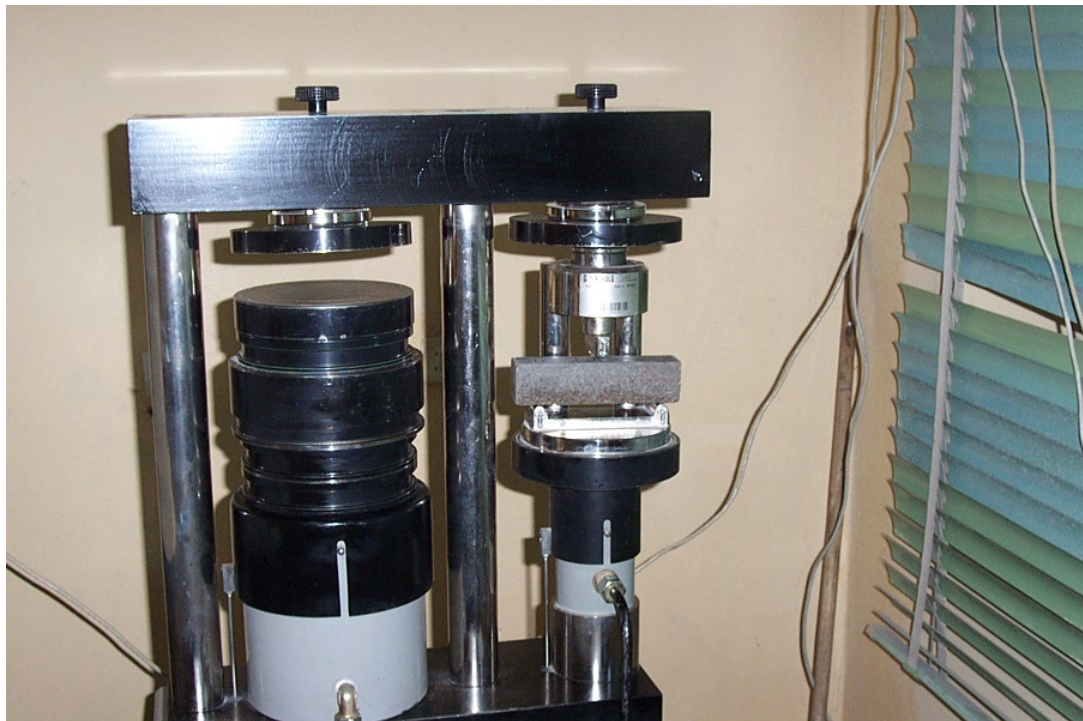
Mortar prism mounted on testing machine to be tested for flexure
